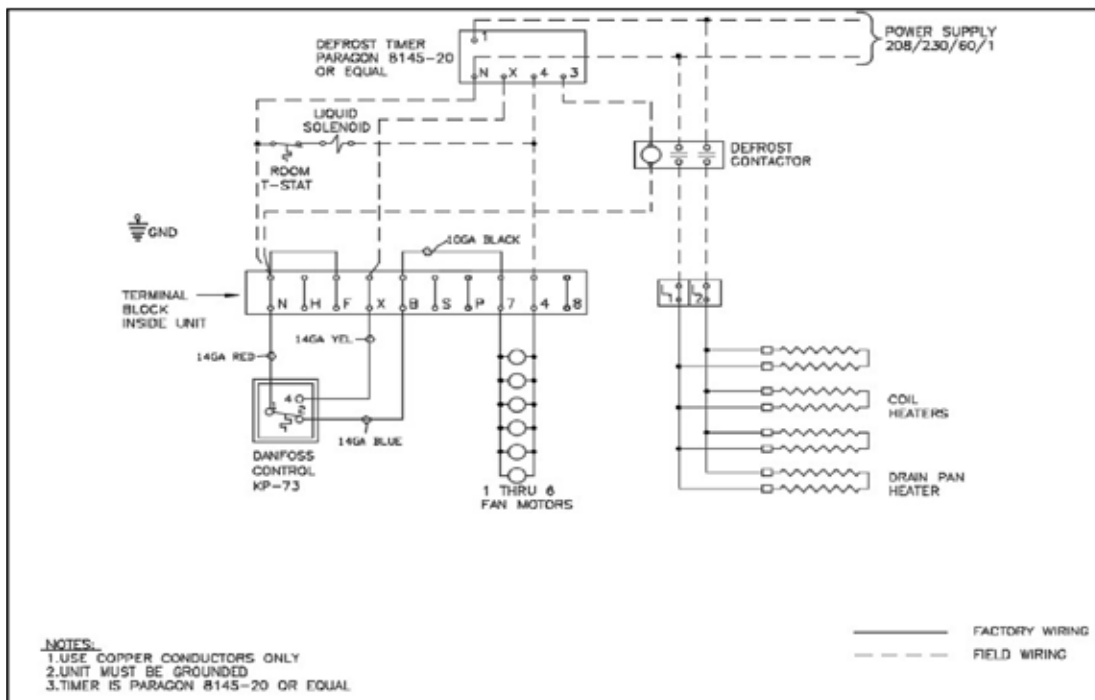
B: ELECTRIC DEFROST WITH TIMER AND DEFROST CONTACTOR WIRING - MOTOR TYPE V
